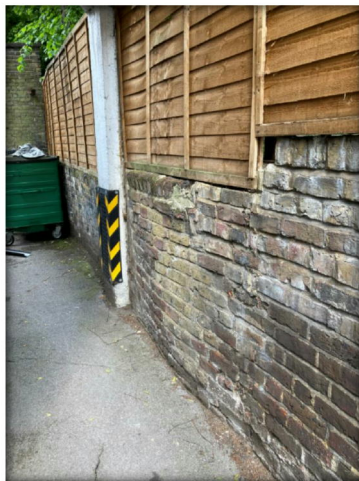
Photograph Of Damage Expressed To Eastern Flank Wall, Adjacent to T03 – Silver Birch.
